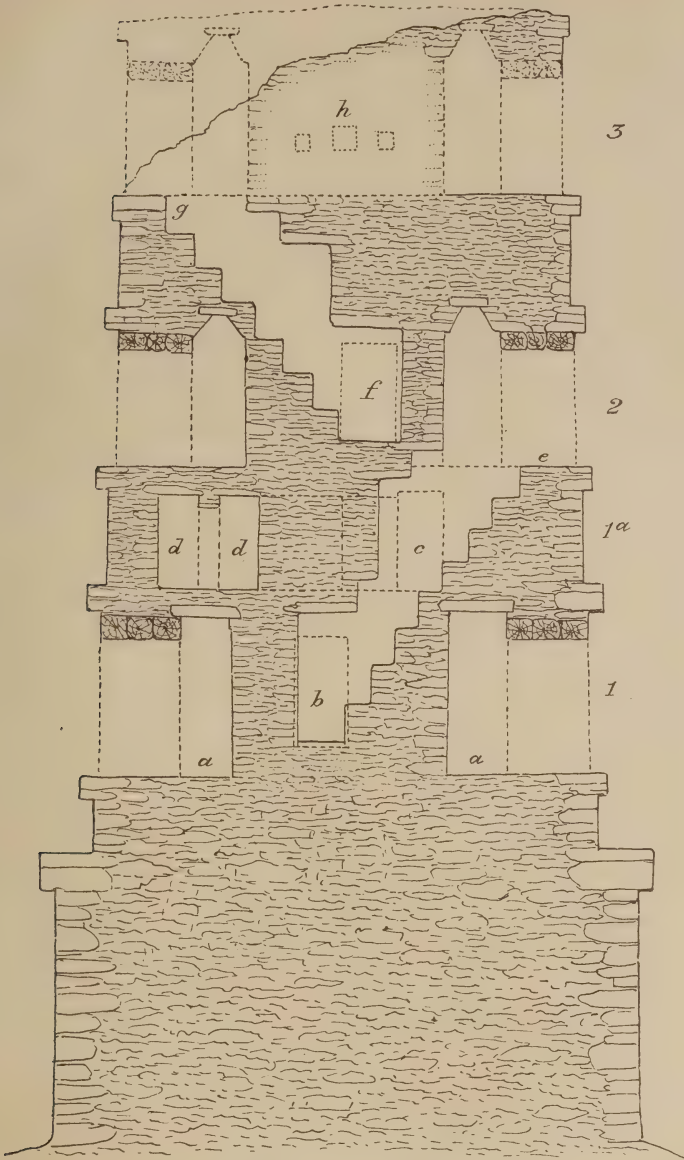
SECTION OF TOWER FROM NORTH TO SOUTH, SHOWING STAIRWAYS AND CONSTRUCTION.
